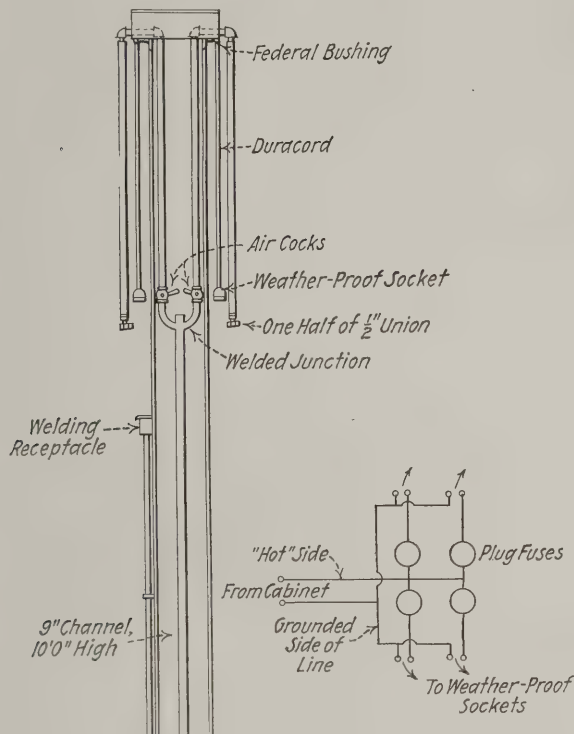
Sketch of One of the Service Pillars Upon Which Are Mounted Facilities for Obtaining Compressed Air, Lighting and Welding Current
